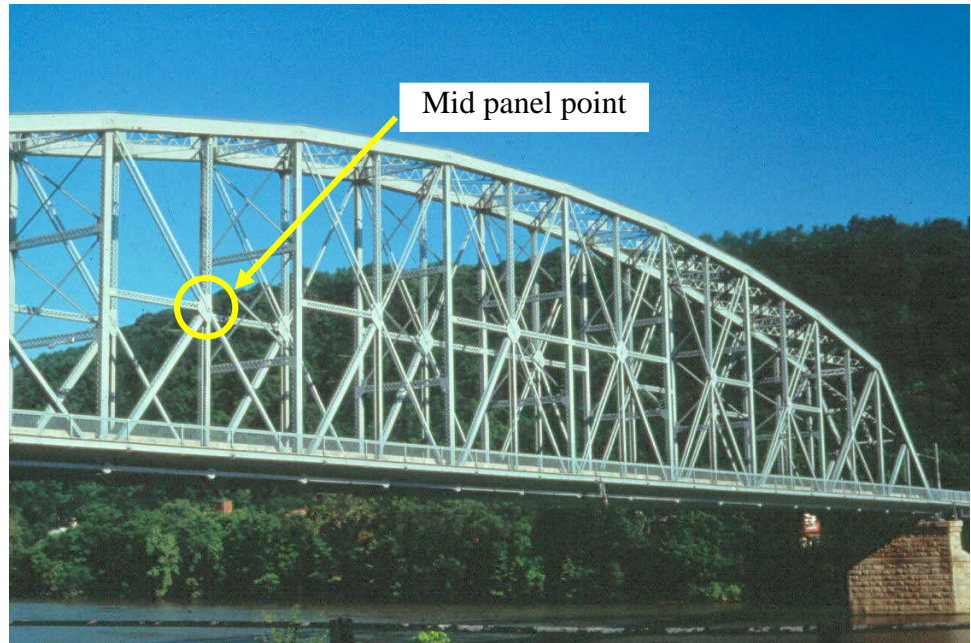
A Pennsylvania Truss, a Subdivided Pratt Truss with a Camel Back Top Chord
